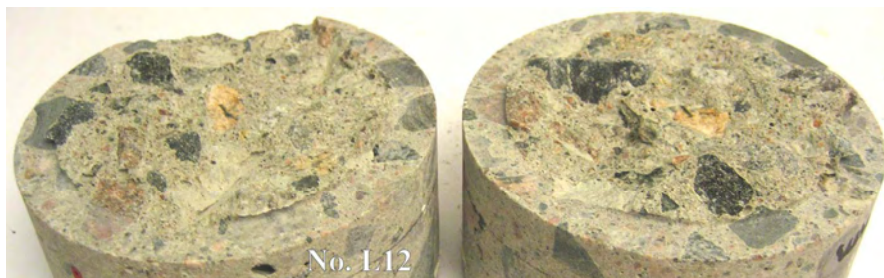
Photograph showing the failure surface for test No. L12 after fatigue test. A part (1/5) of the notch has loosened.
